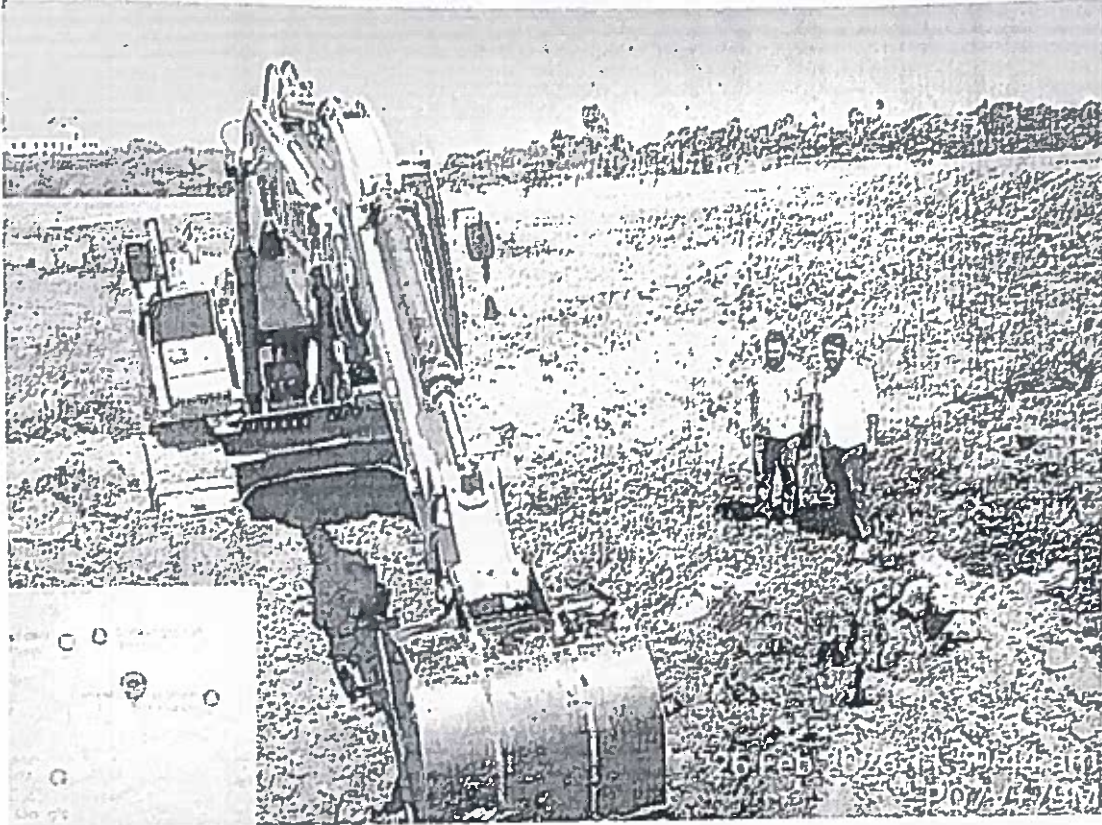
Excavation Commences: Site Inspection (26 Feb 2026)
